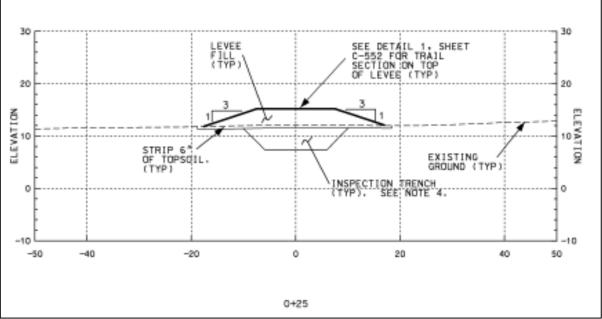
Typical Cross Section of the Duden-NSD Levee
